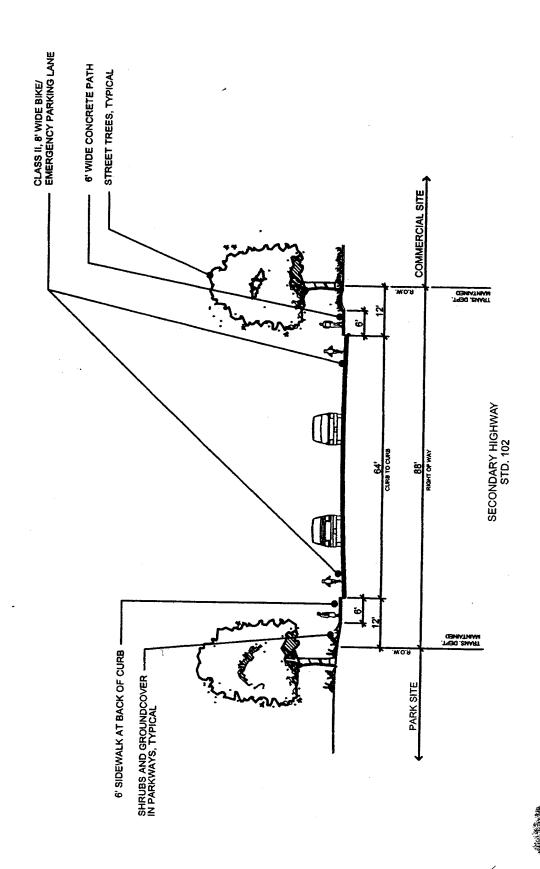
CROSS-SECTION · G STREET AT PA 9/PARK SITE
